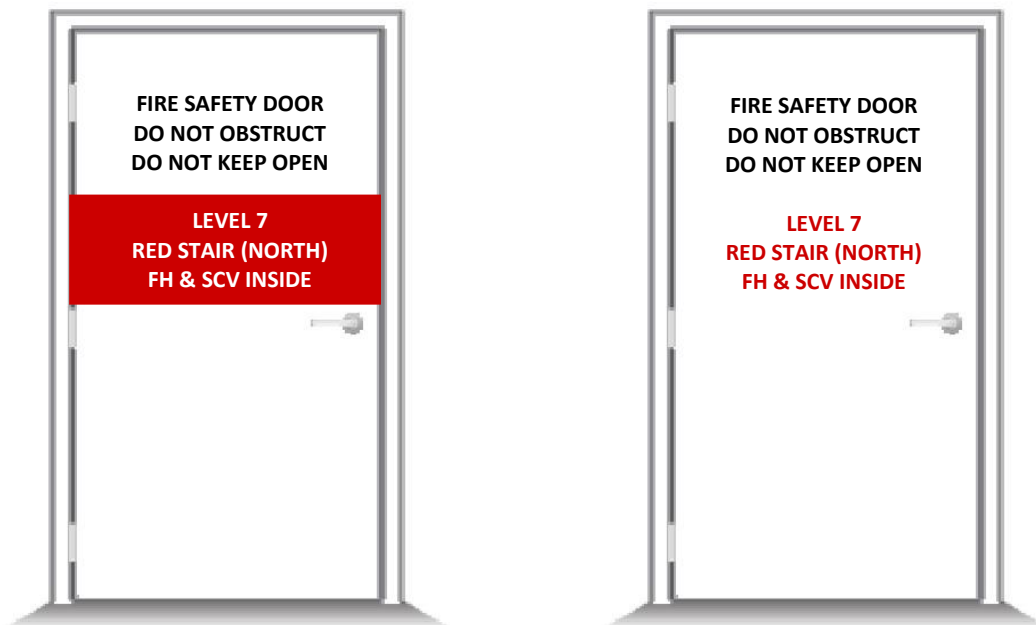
Scissor stair fire door identification - external (building side and outside) face of fire stair door.
